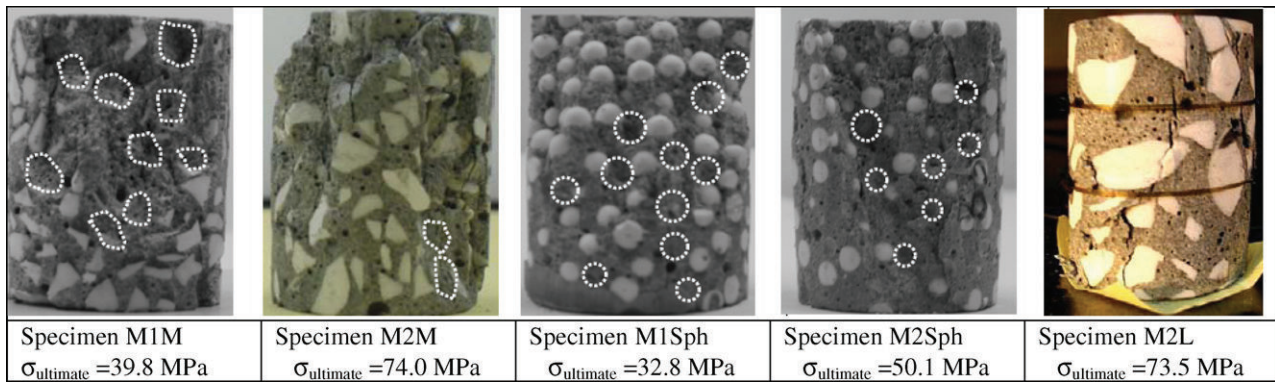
Fracture surfaces of composite specimens (M1M, M2M, M1Sph, M2Sph) after failure under uniaxial compression. Decohesion is showed with dotted lines.
